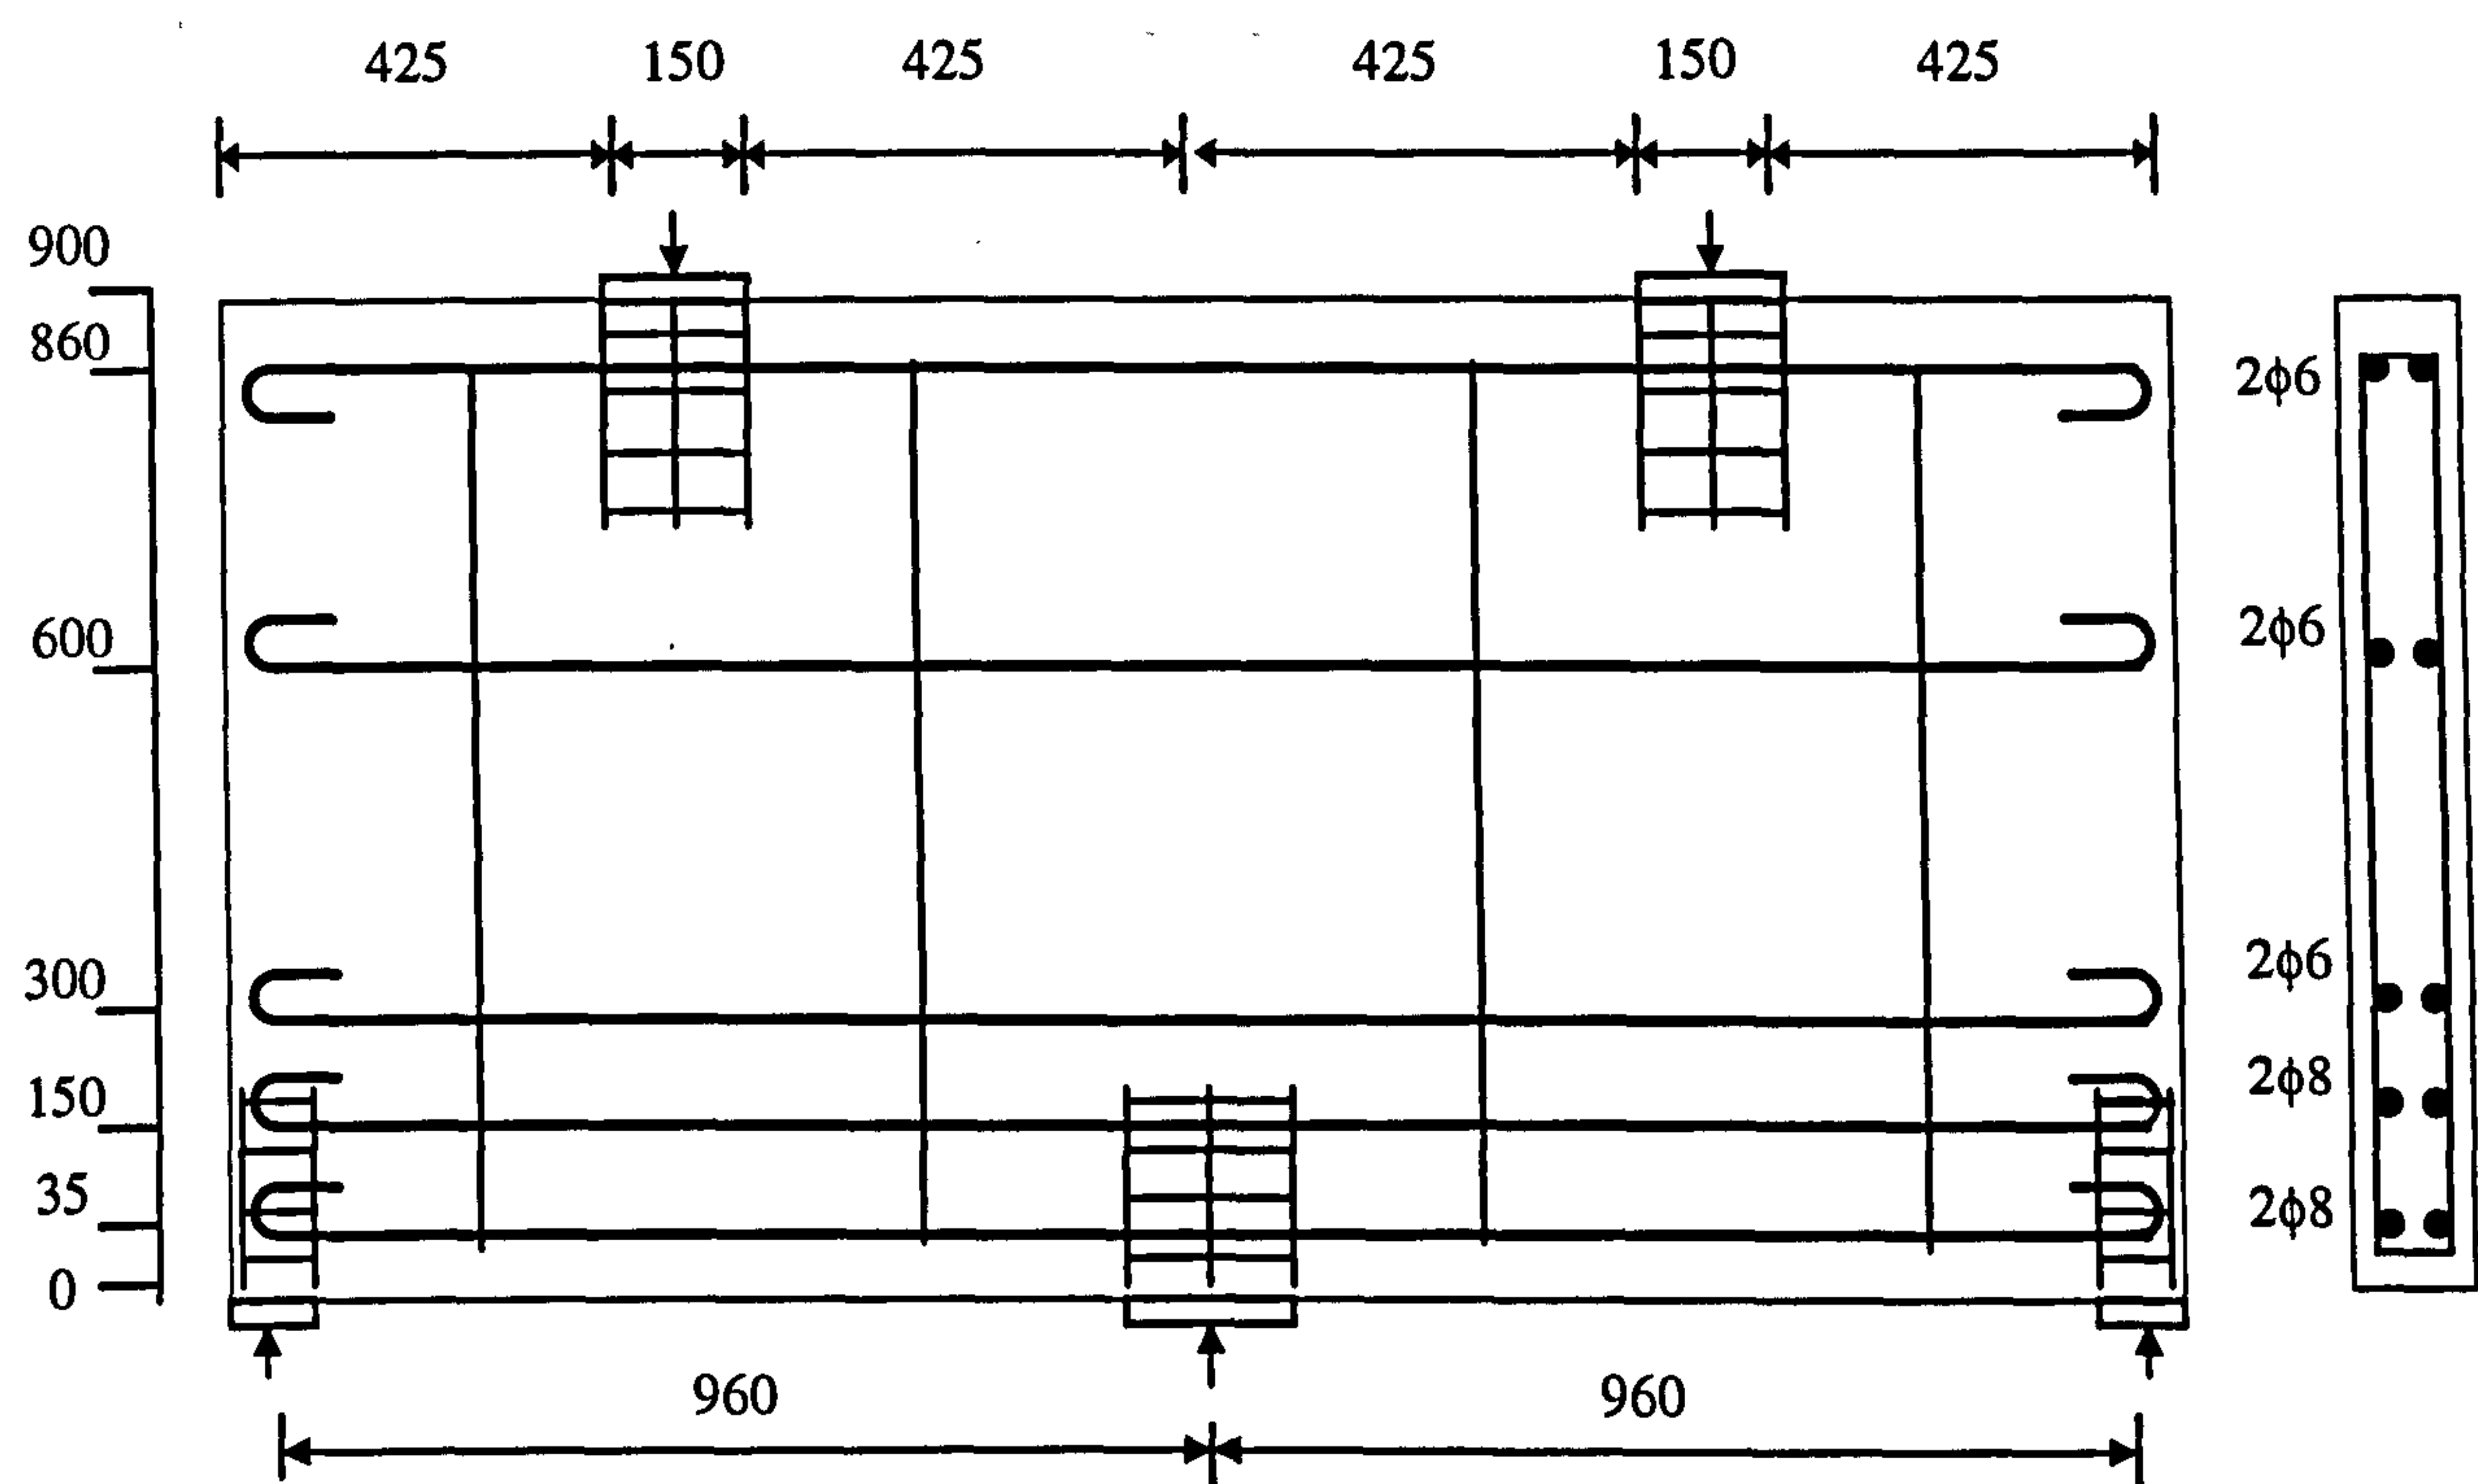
(c) Dimensions and reinforcement details for TGRAS3
